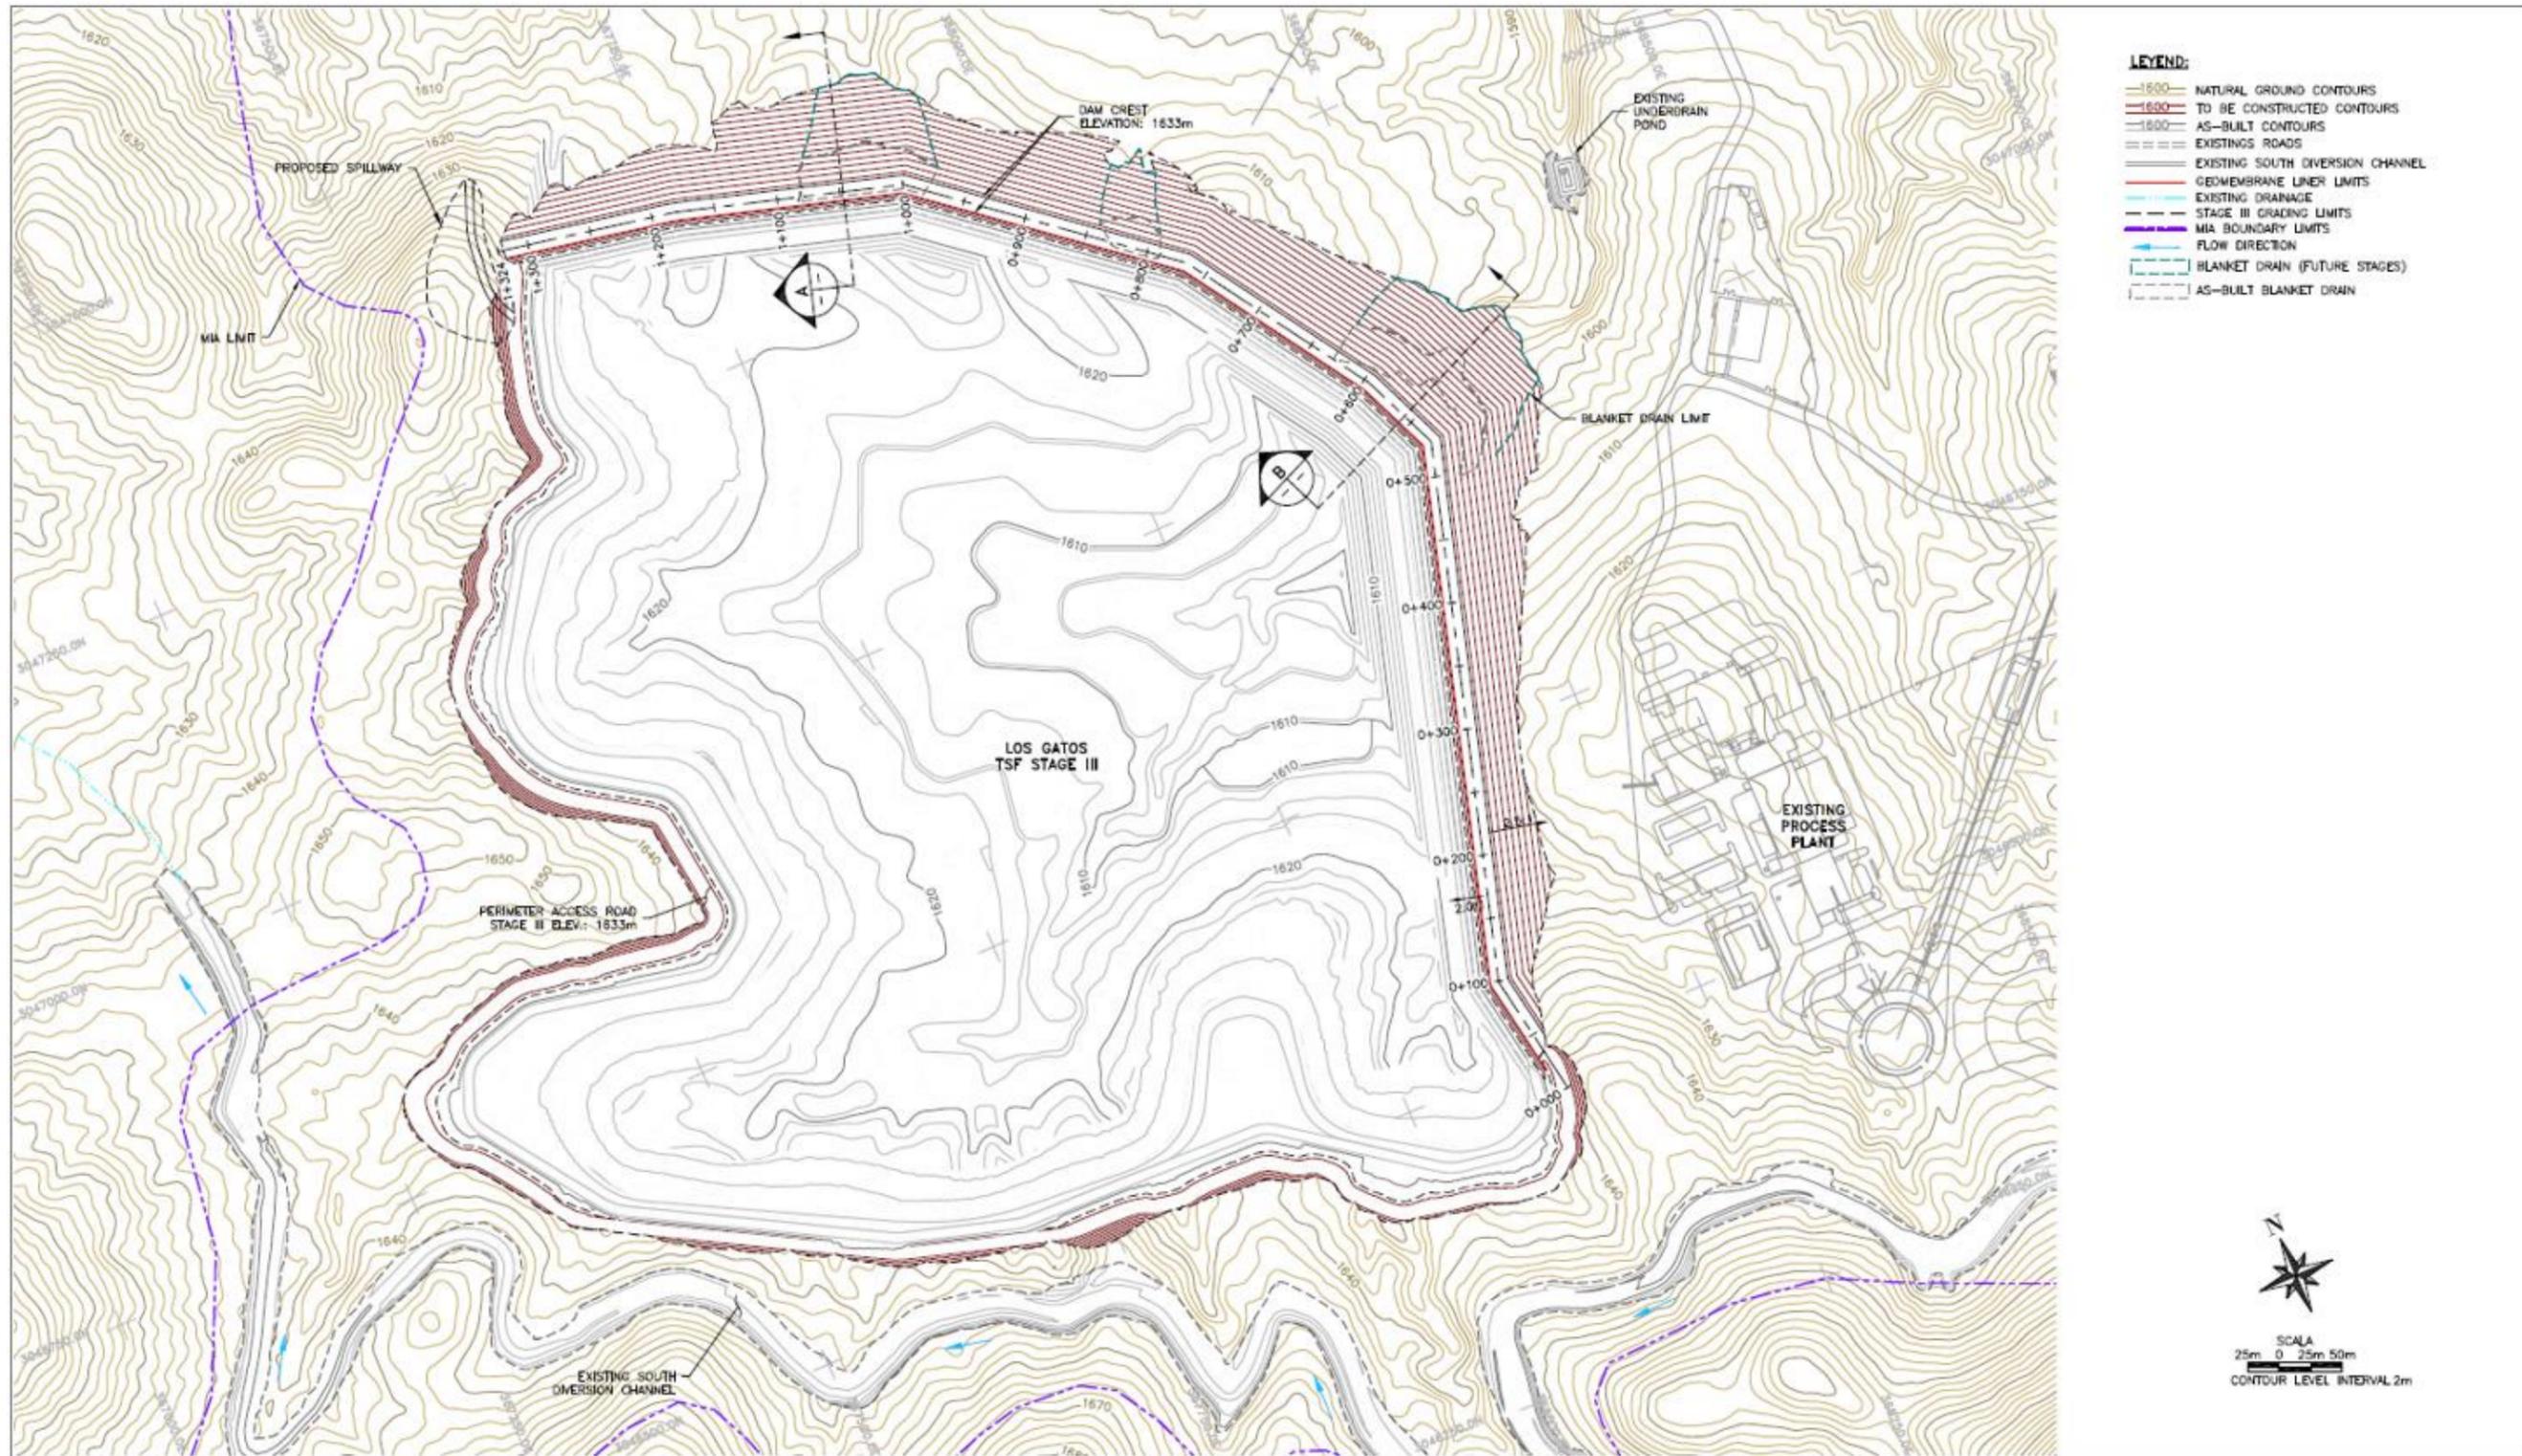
TSF Stage III Plan View (ultimate elevation)
